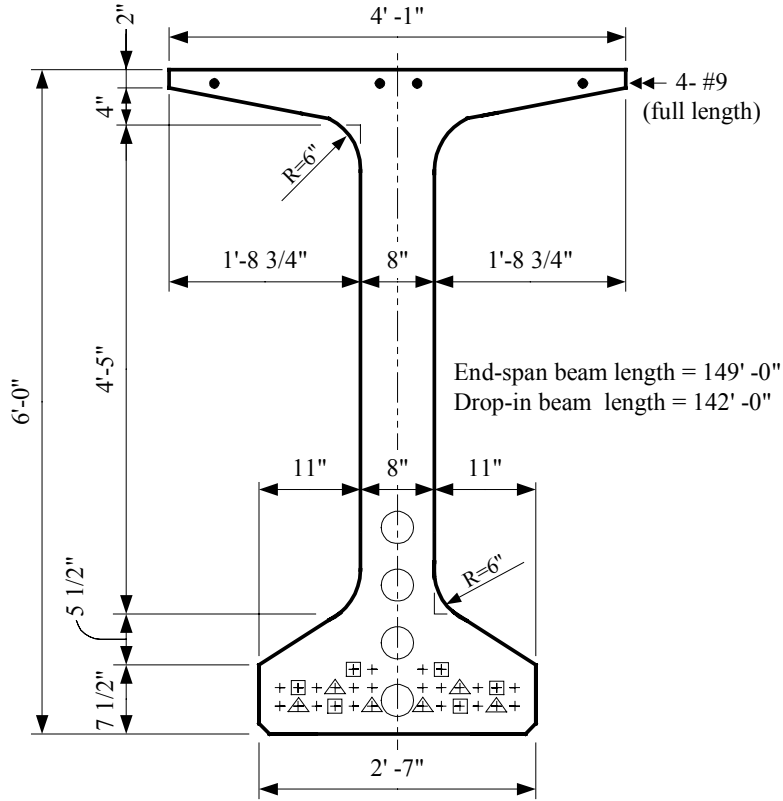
Cross Section of Black Warrior Spliced-Girder Bridge
